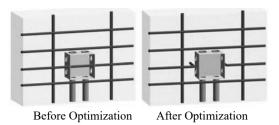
Detailed Design for Embedding Conduit Boxes in Prefabricated Wall Sections
